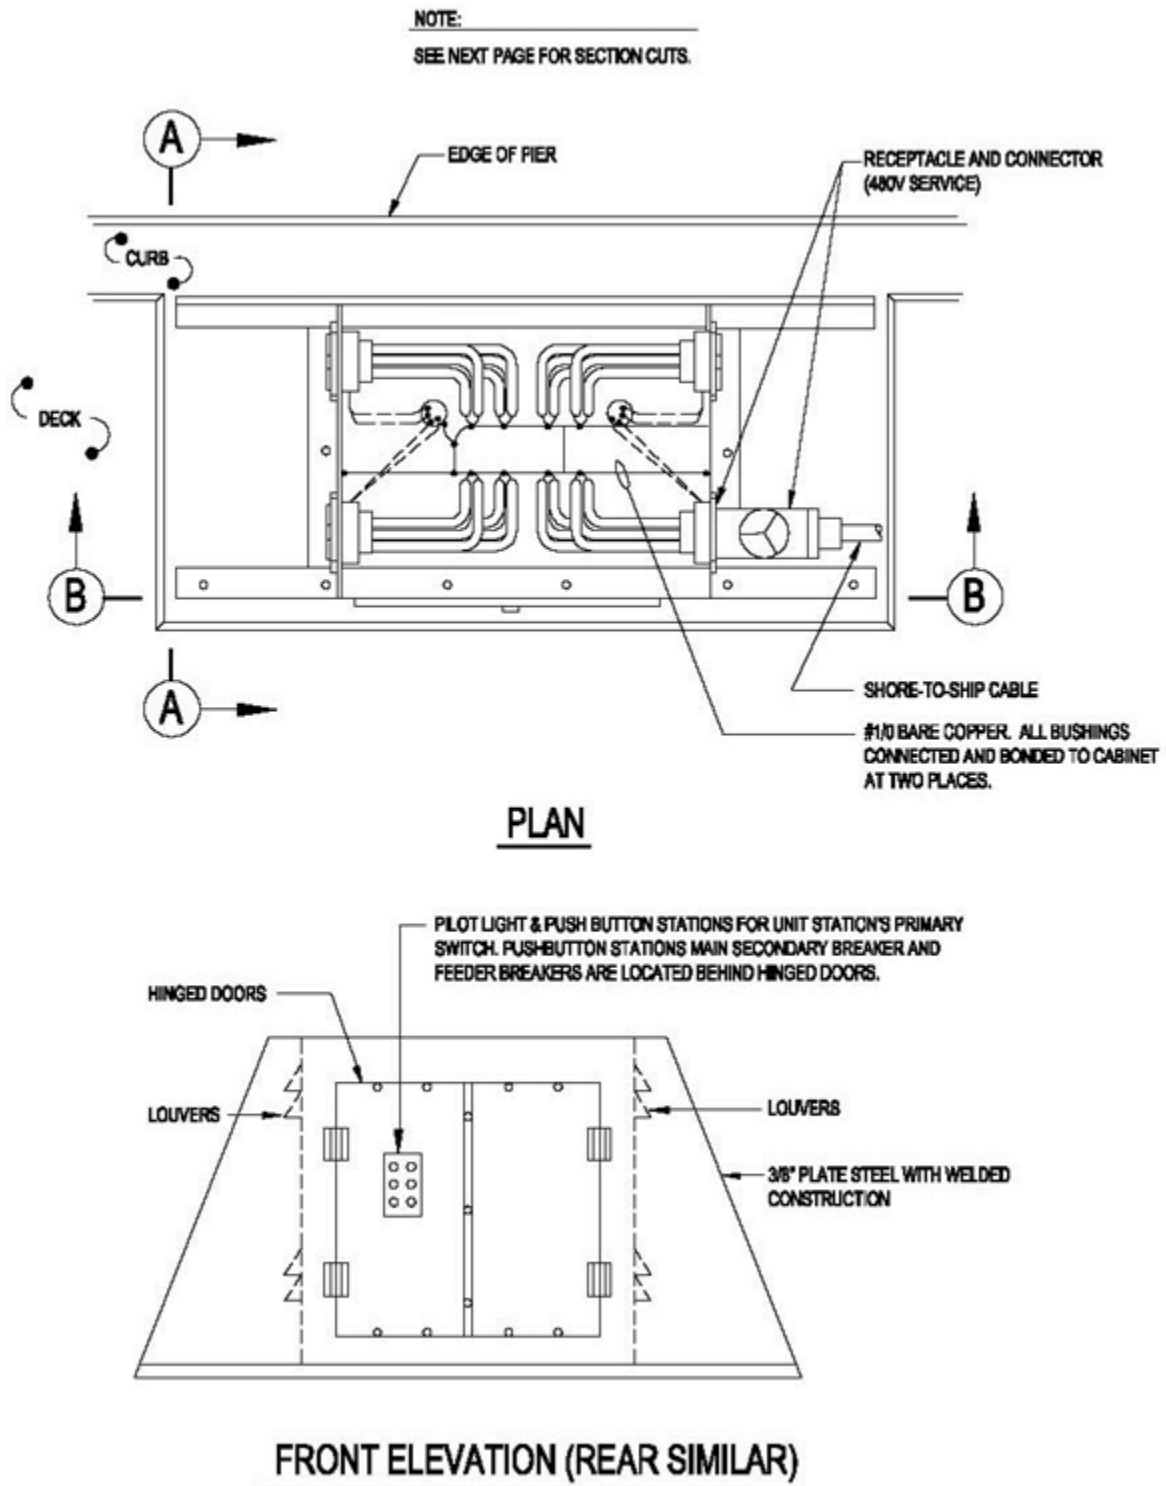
(b) Ship Service Outlet Assembly (2 of 2)
